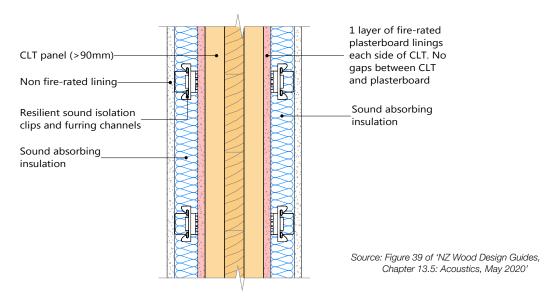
Mass timber wall panel with fire rated wall linings mounted on resilient acoustic clips and furring channels
